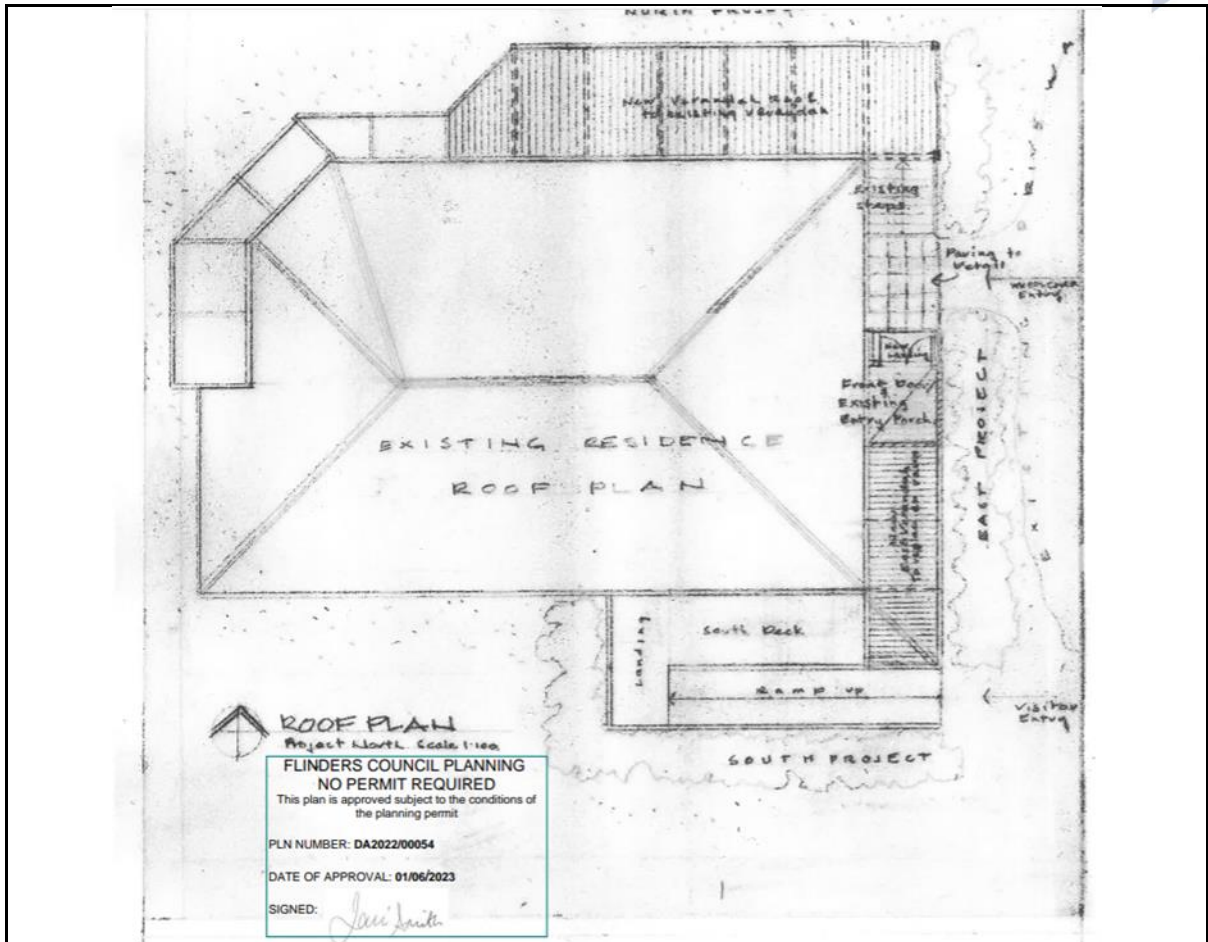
The deck to the south of the dwelling at 10 Munro Place.
